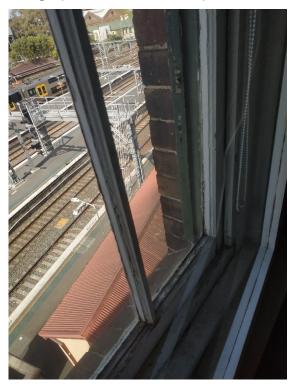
Window framing on southern side of second floor of 125-127 Little Eve leigh Street showing consistent sill and frame without cracks or crevices
